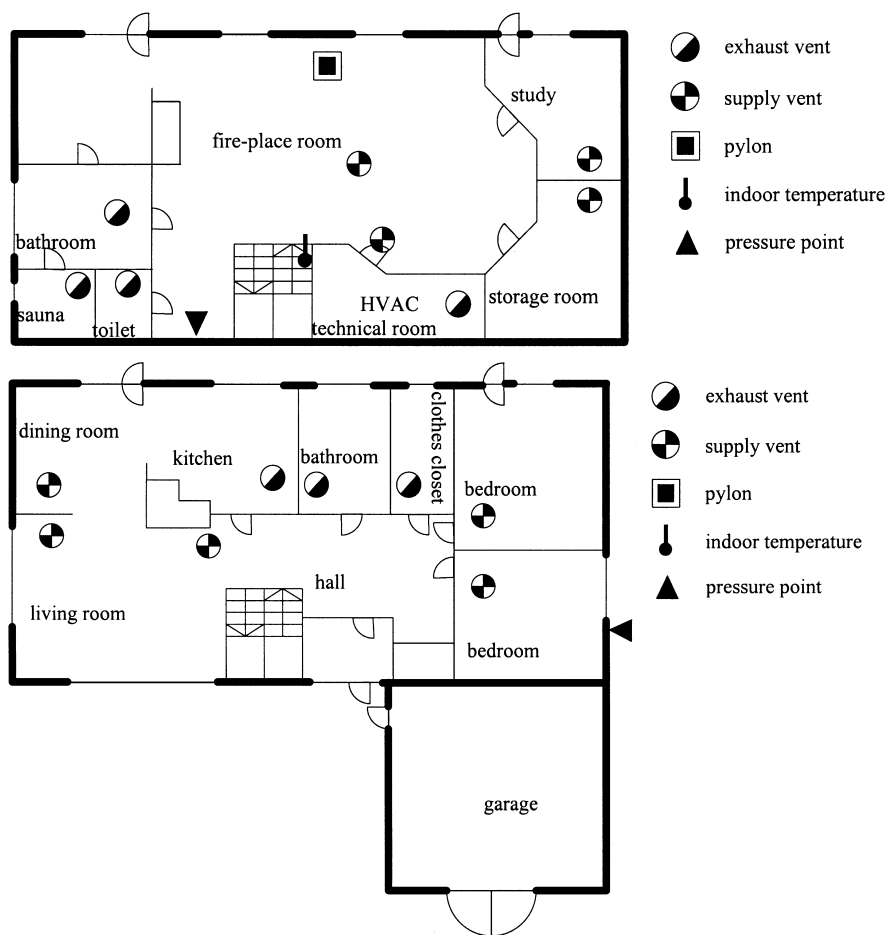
Floor plan and sampling points of basement of the two-storey basement house (B).
